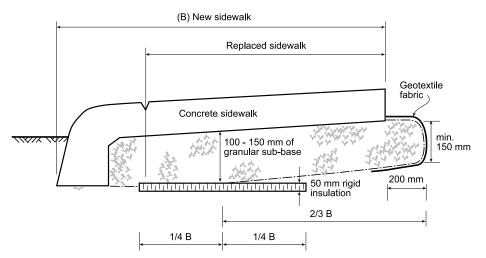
Typical cross-section of sidewalk with rigid insulation-enhanced sub-base.
